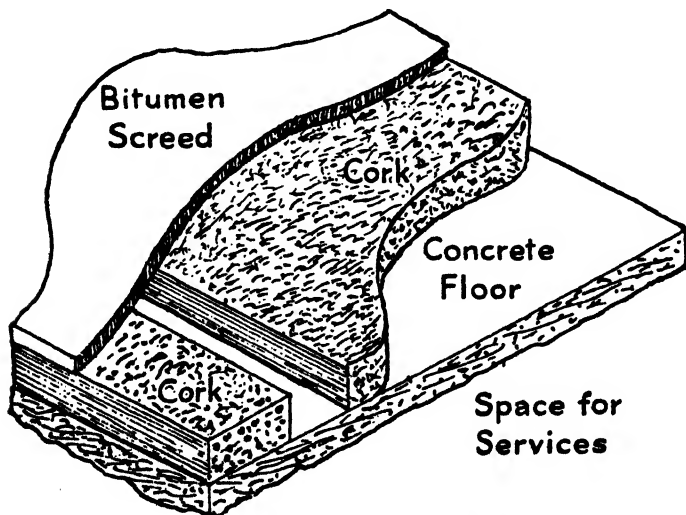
Nonpareil Cork Floor of Newalls Insulation Company.
